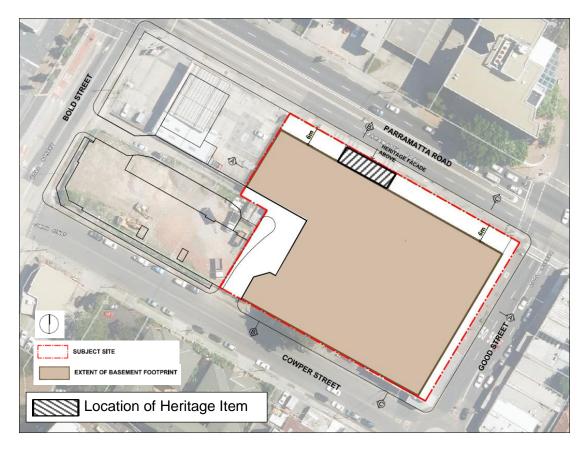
Deep Soil Zone and Extent of Basement Plan
